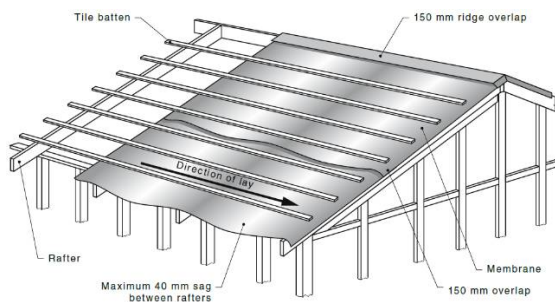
(A) INSTALLATION OF MEMBRANE UNDER TILED ROOF
